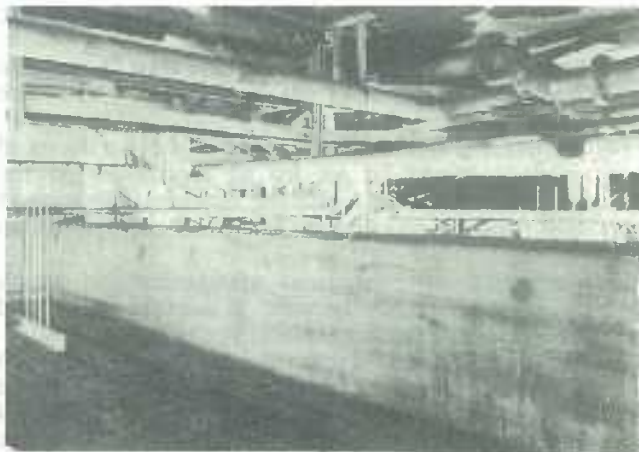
Services wing basement — deep structural beams restrict work runs and access.
